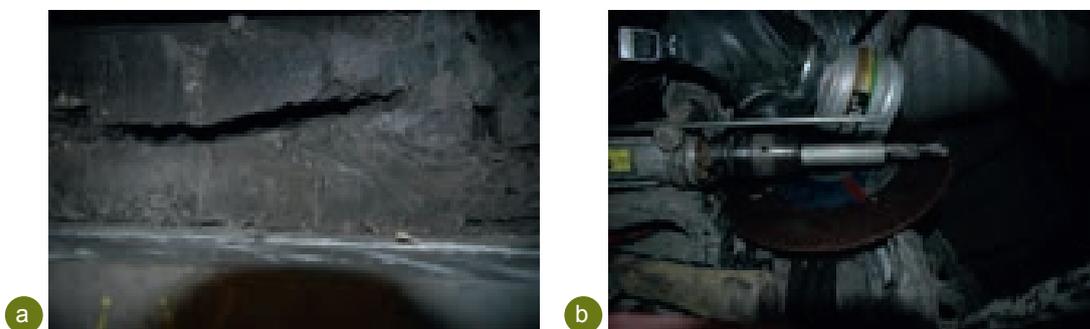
(a) Groove in the clay made when drilling the wood of the temporary lining; (b) A small tube was placed over the drill rod, preventing it from cutting into the clay.
